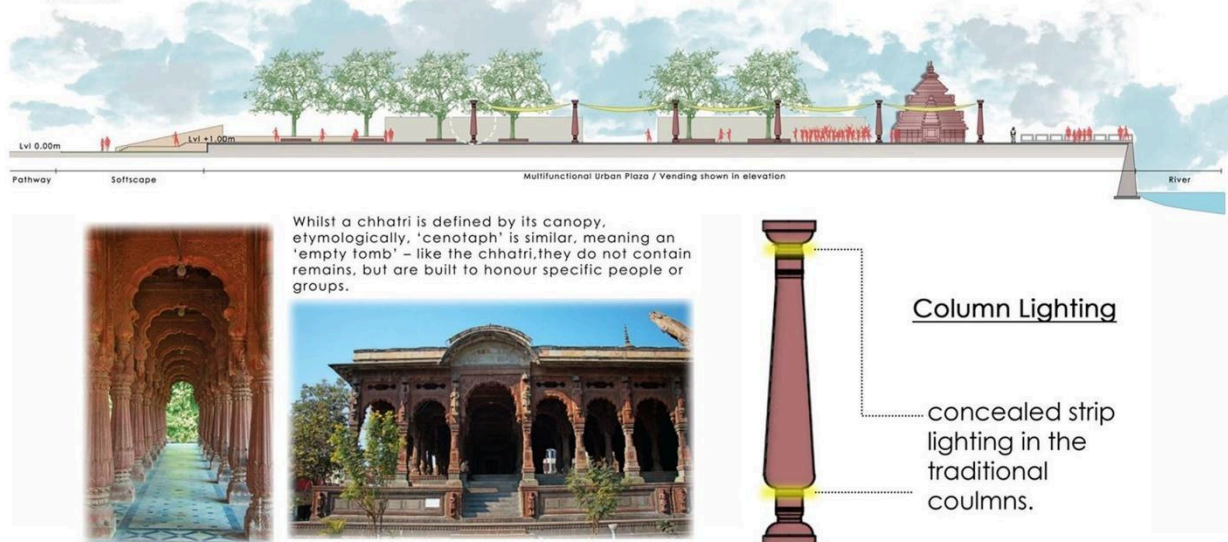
Section Showing the Urban Plaza and the Traditional Column.
